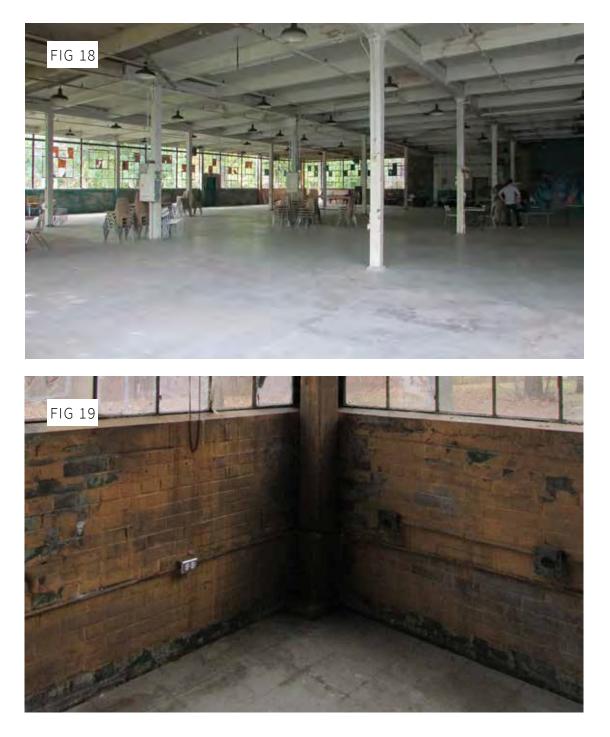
(TOP): Interior view of the South Building showing cast-in-place concrete floor in good condition, wood structural system, and industrial lighting (ERA, 2016). FIG 19 (BOTTOM): Interior view of north-west corner of the South Building showing peeling paint on masonry perimeter wall (ERA, 2016). state of deterioration (Fig 13). Both sills are in poor condition. The sills show spalling to the extent that the structural rebar is exposed and corroded. In addition, one brick unit above sill "B" is spalled.
